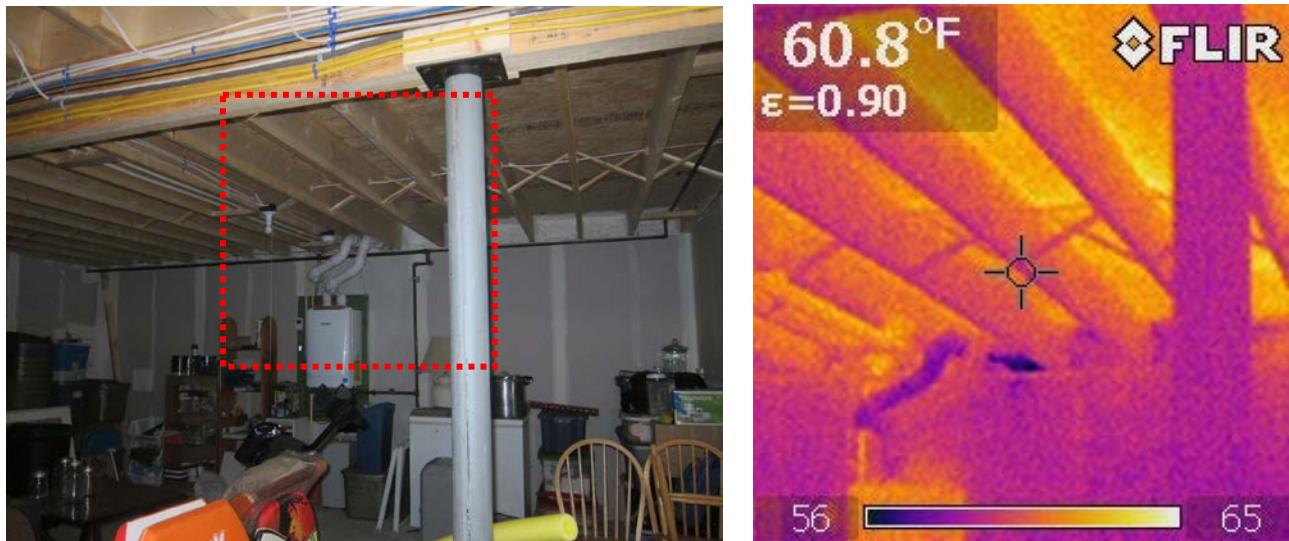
Ceiling of first floor from basement infrared image, Easthampton Lot 30
